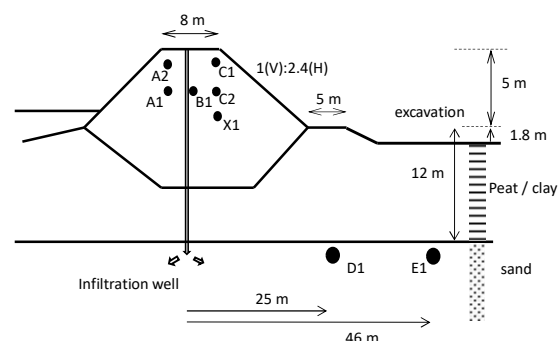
Test setup and dimensions, A1, A2, B1, C1, C2, X1, D1, E1 represent locations for hydraulic head measurements shown in Figures 35 and 36.
